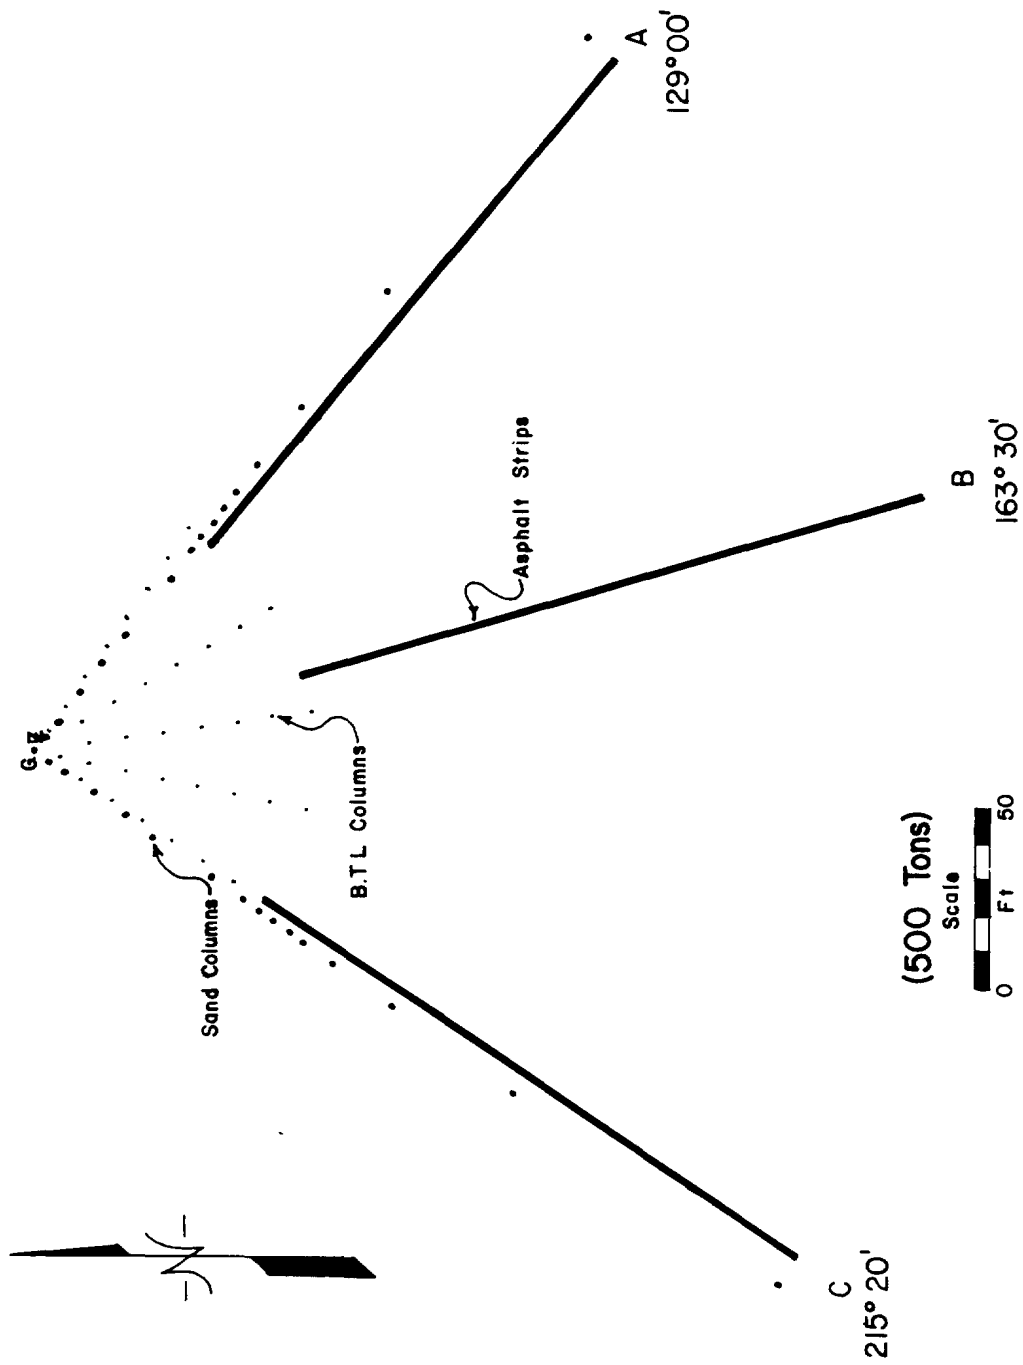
Layout showing sand columns, B.T.L. columns, and asphalt strips.
